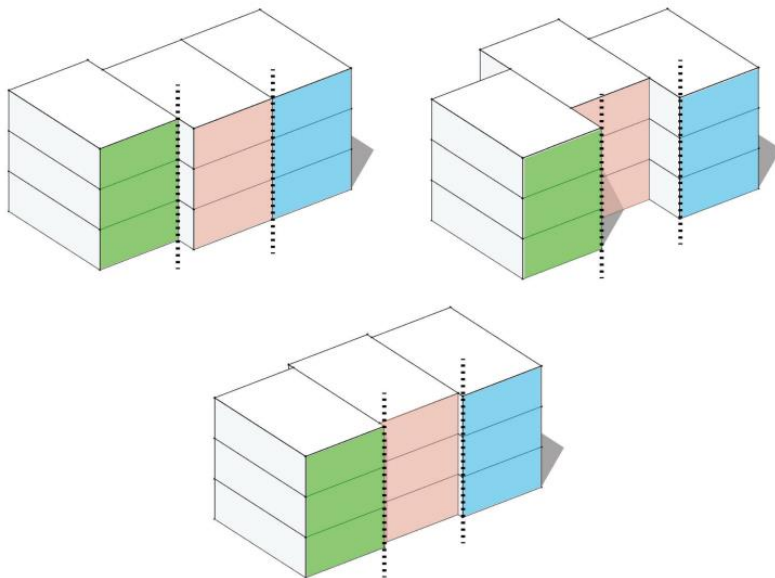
Possible ways to divide a horizontal mass into three elements (Section 4.1.4).
